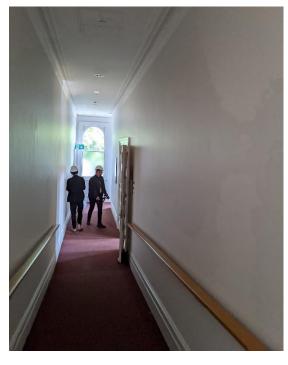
Corridor adjoining Ballantyne Room Figure 75
